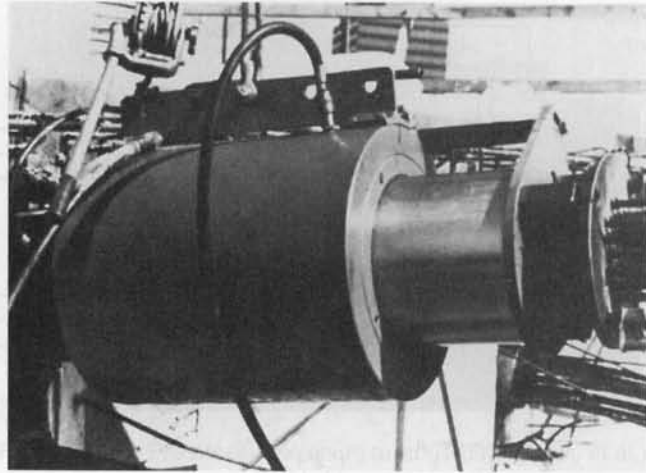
Intermediate connections between frames of the prestressing system for continuous beams (Nawy et al.).
